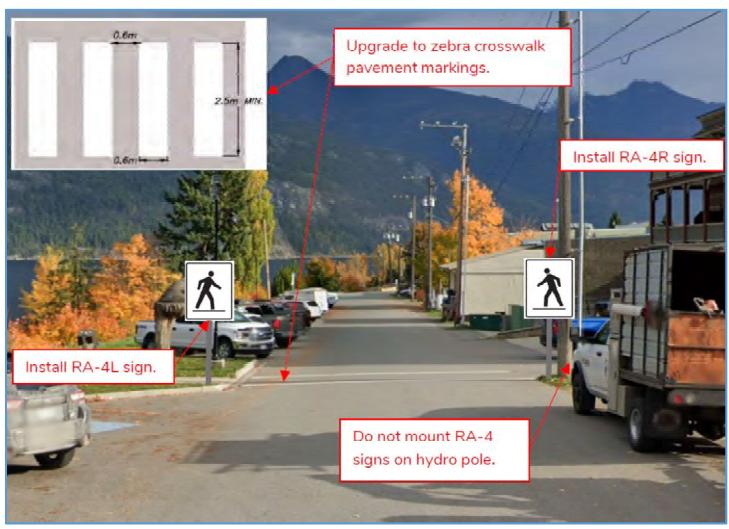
Recommended Crosswalk Signage and Pavement Markings on Water Street
